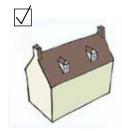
Good example of side extension (garage). The addition to the new part respects the building's mass character and roofline
